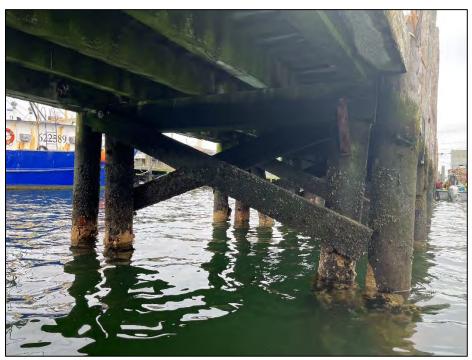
View of the cross bracing and pile cap orientation and typical condition below the timber pier south of the building pier.
